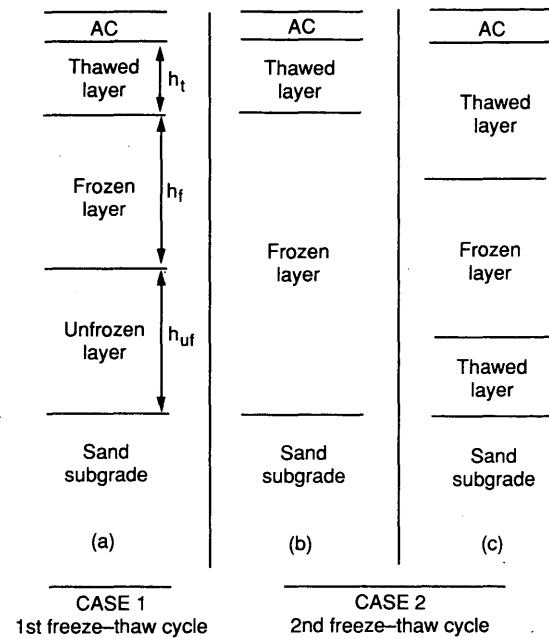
Actual pavement structures in TS-1 during thaw cycles.
